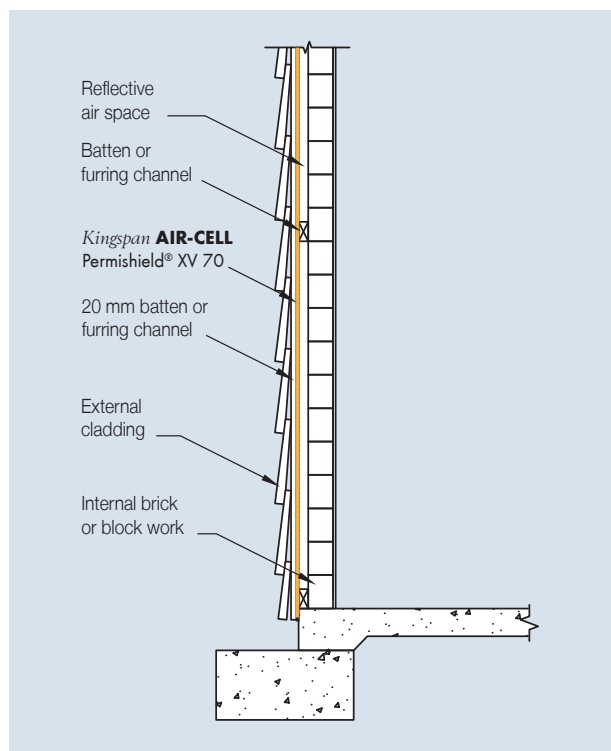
Side elevation of Kingspan AIR-CELL Permishield® XV 70 in a reverse brick veneer wall
